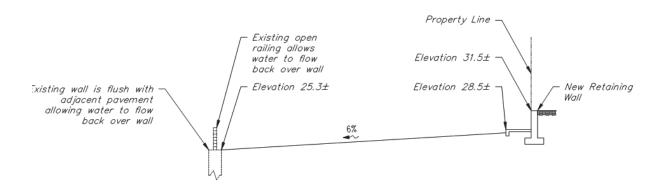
Cross section through Beach Boulevard between Paloma Avenue and project site.
